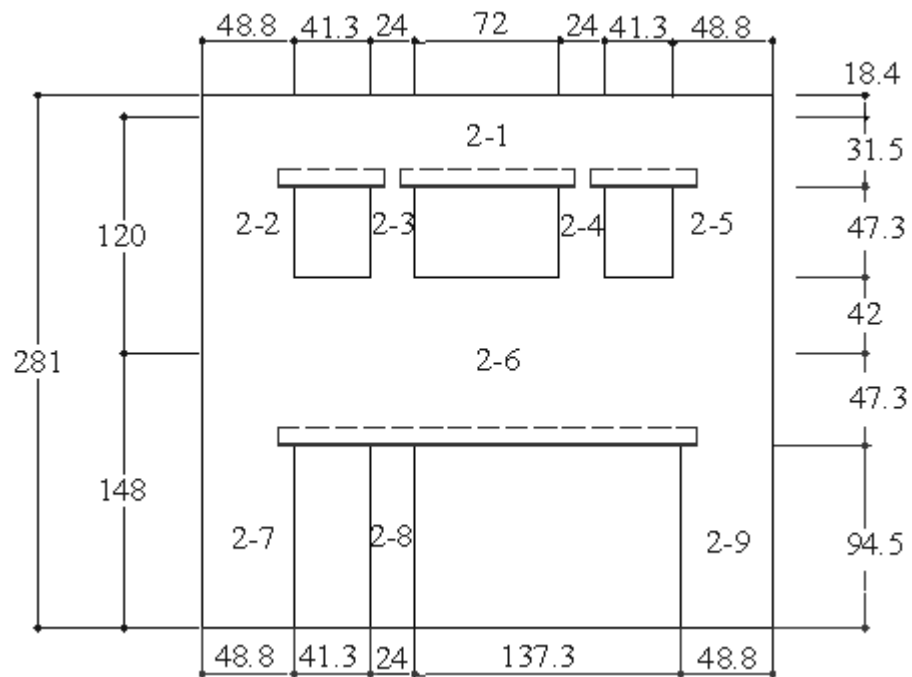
Elevation view of Wall 2 (dimensions are in inches).
